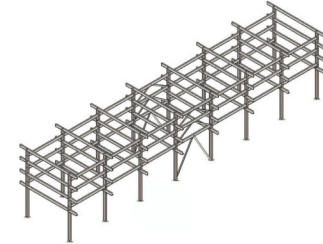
Typical four-level pipe rack consisting of eight transverse frames connected by longitudinal struts.
